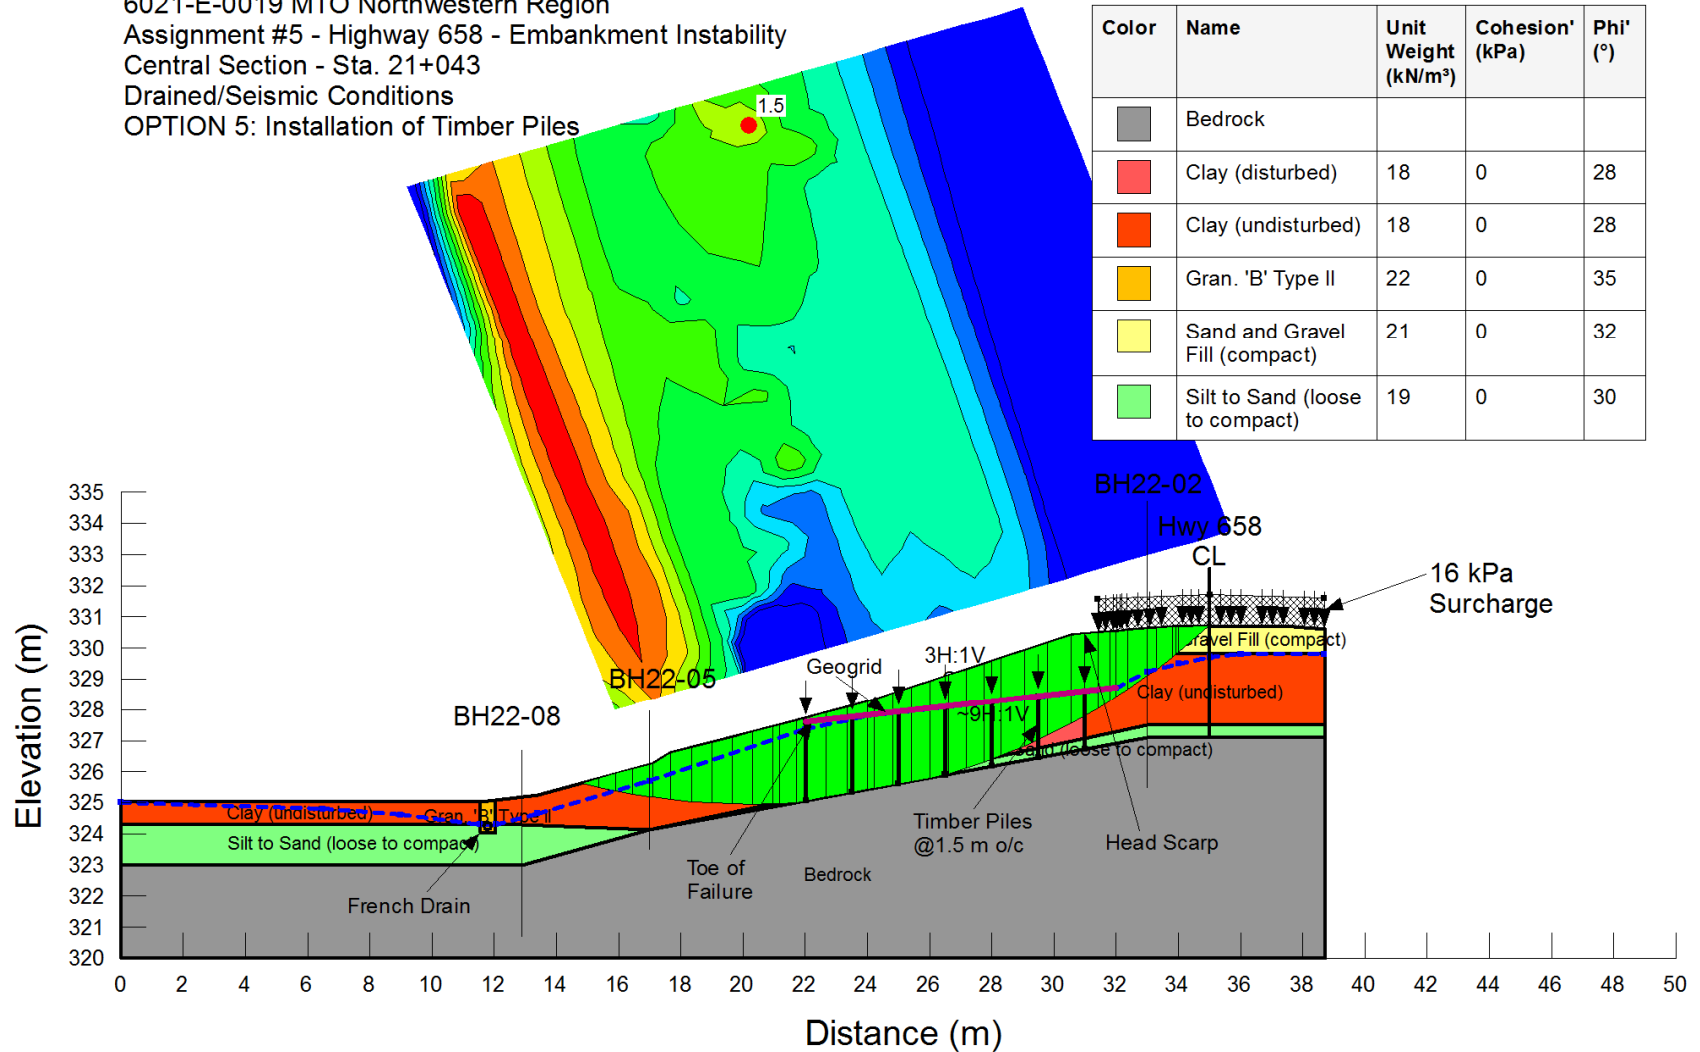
Central Section (Sta. 21+043) – Remedial Option 5: Installation of Timber Piles, Global Failure – Drained Seismic Conditions
